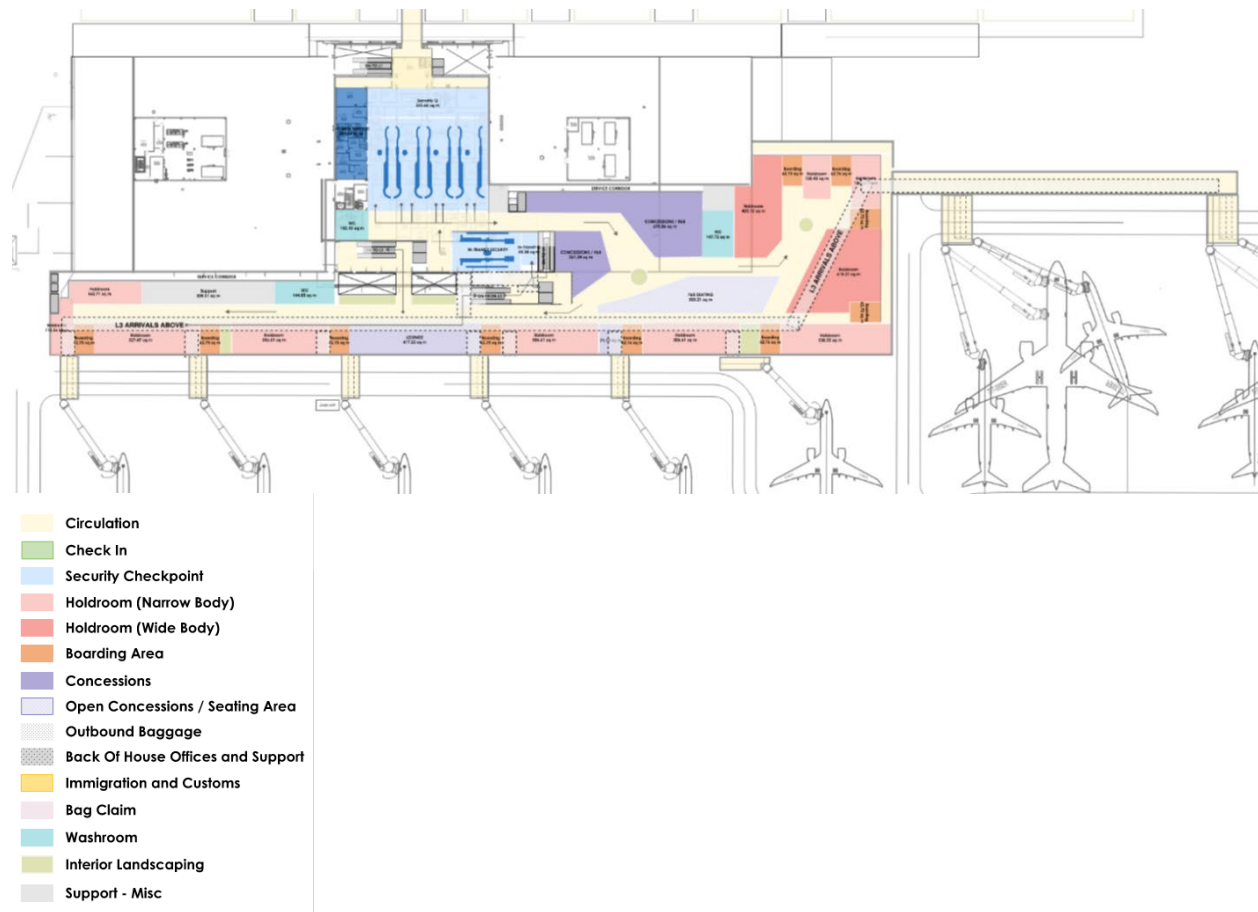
Preferred Air Terminal Expansion – Main Floor Plan
